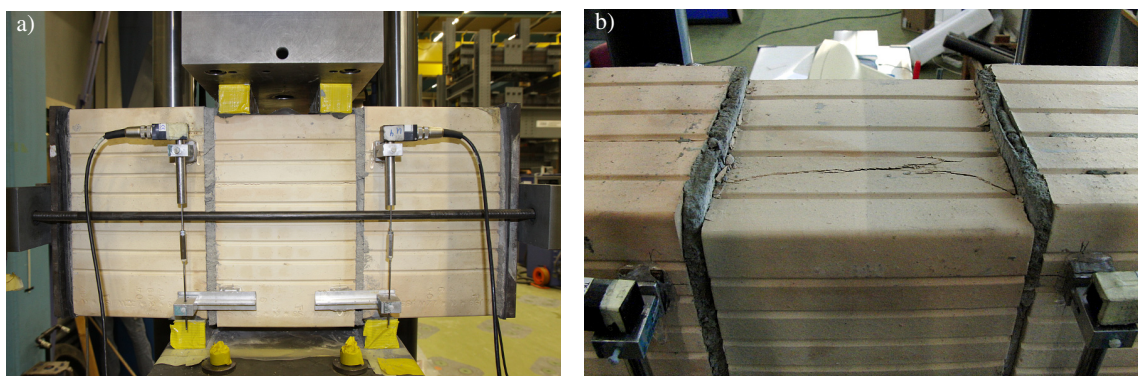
Failure of wallettes tested in shear: Global failure (a) and local brick failure due to shearing off of the mortar pillars (b).
